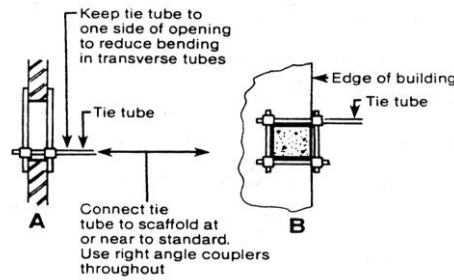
Box tie. A. Vertical or horizontal section through wall. B. Horizontal or vertical section through structural member.
